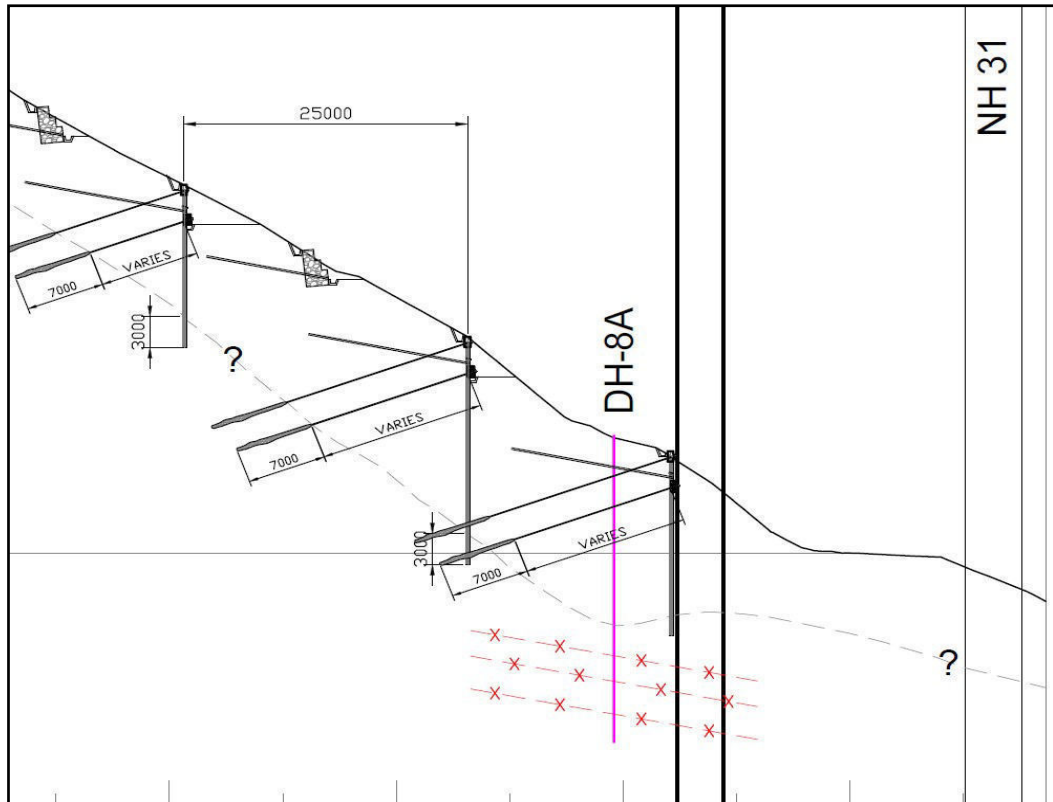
(a) - Longitudinal Section along slide showing rock line and plan showing active slide zone
